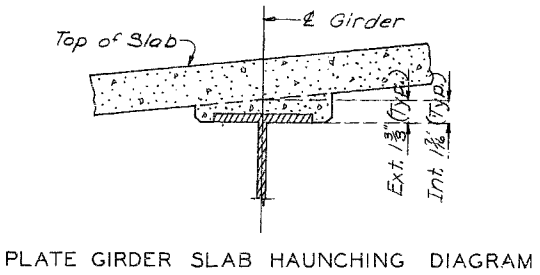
PLATE GIRDER SLAB HAUNCHING DIAGRAM
